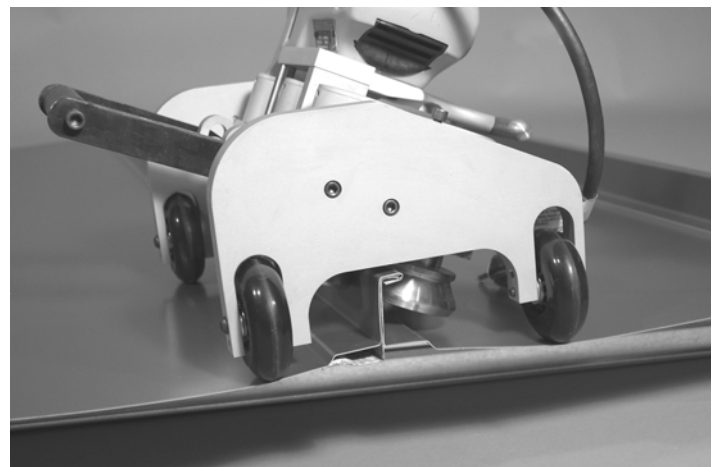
Close-up view of the Seamer Roller Dies in proper position to form the seam.
